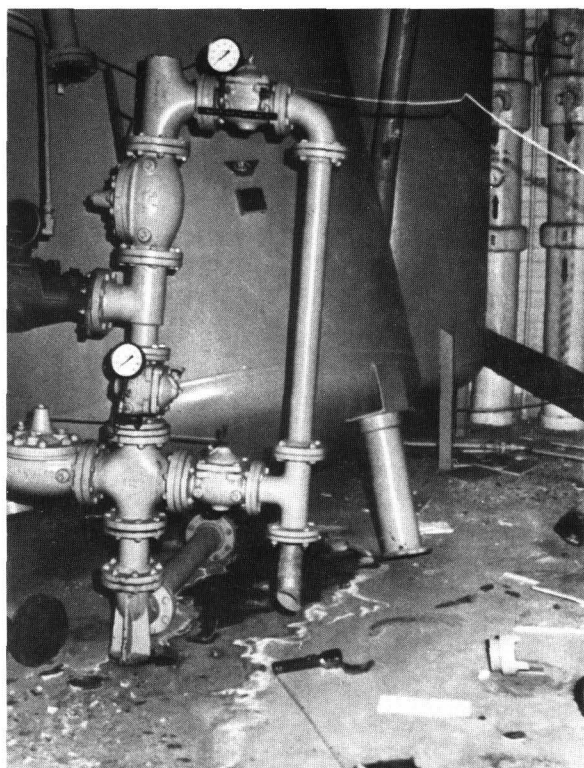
Olive View Power Plant. Water softeners collapsed when screwed pipe legs failed. J. M. Ayres, photograph.
